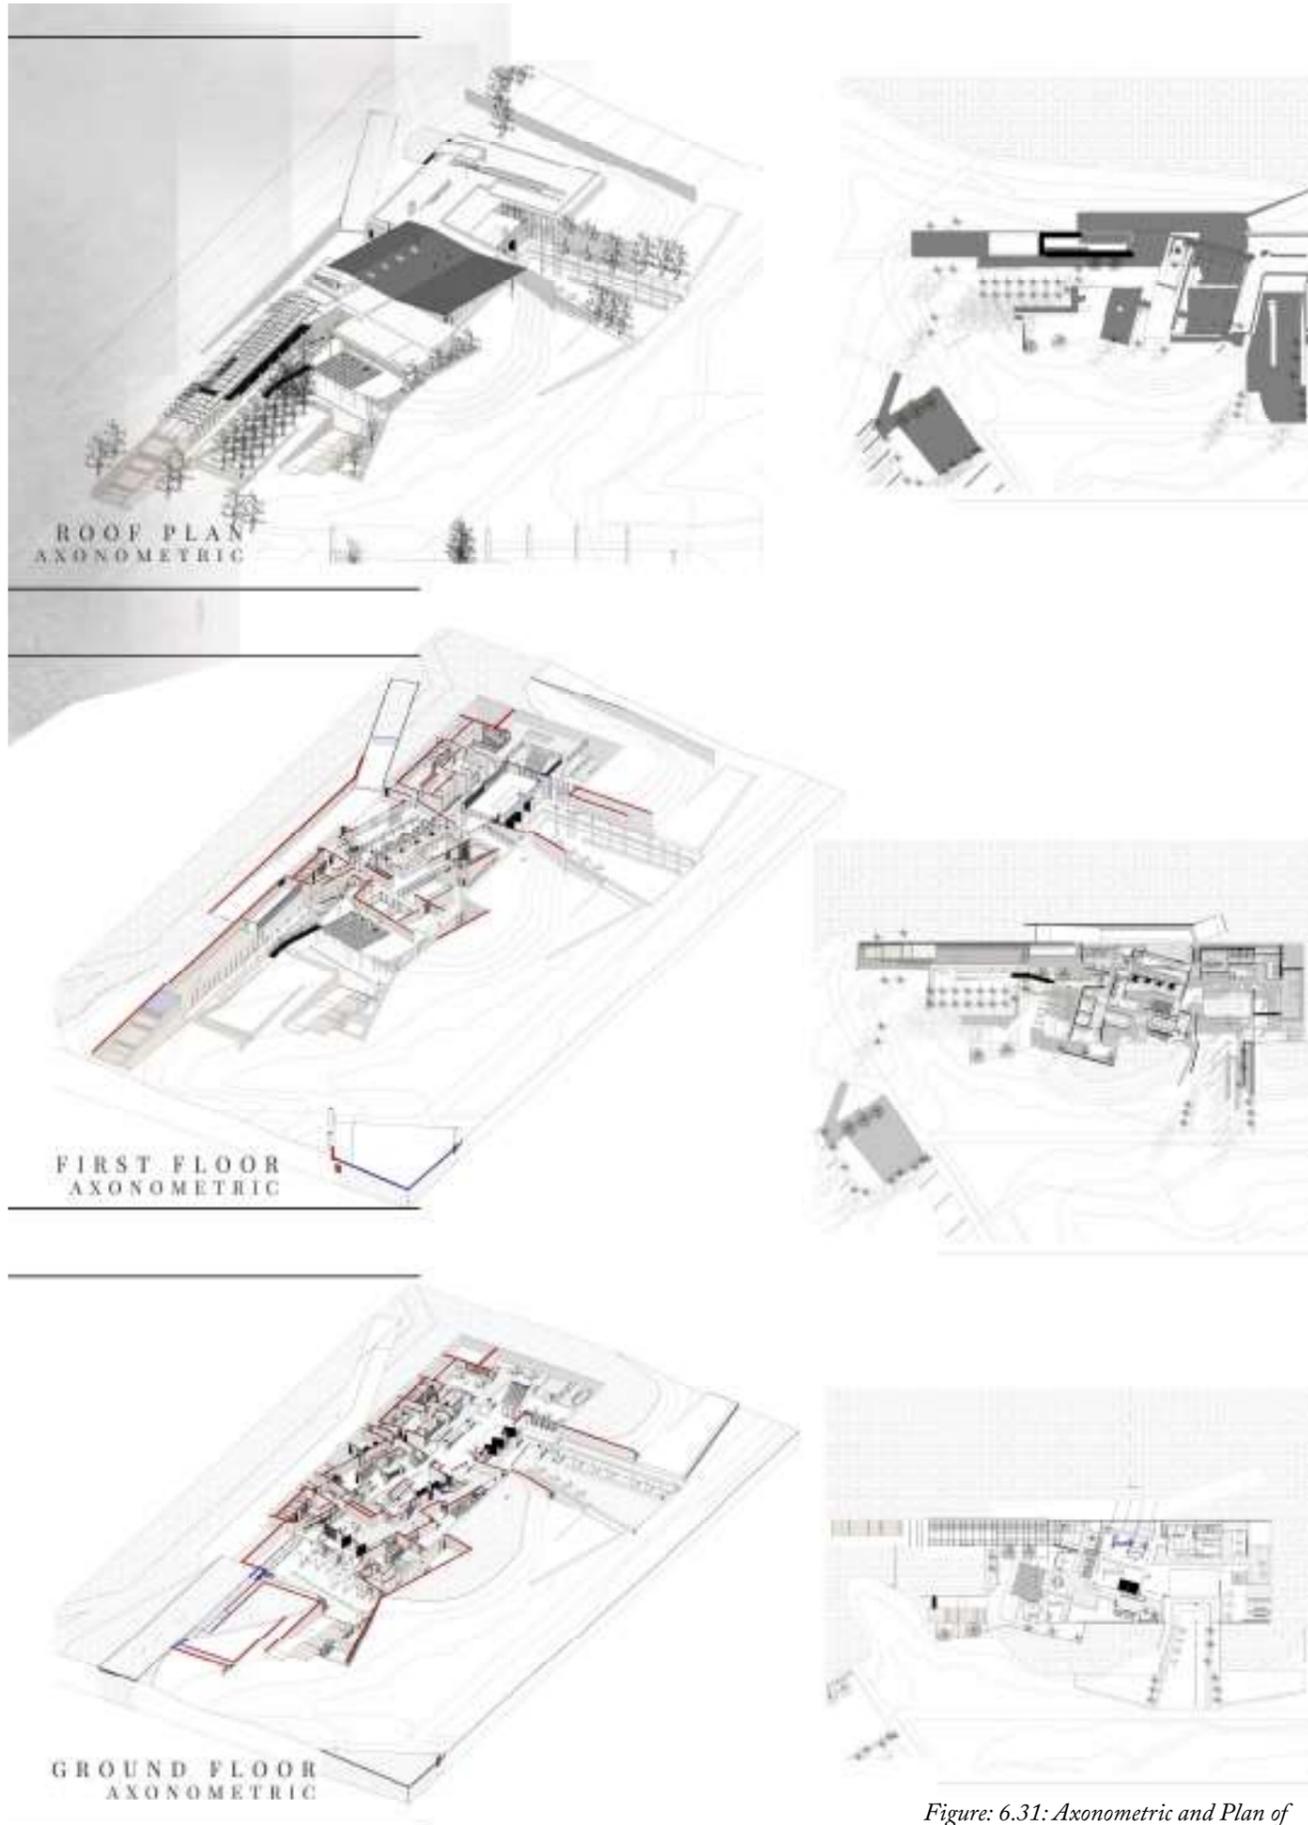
Axonometric and Plan of June Crit (Author: 2018).
